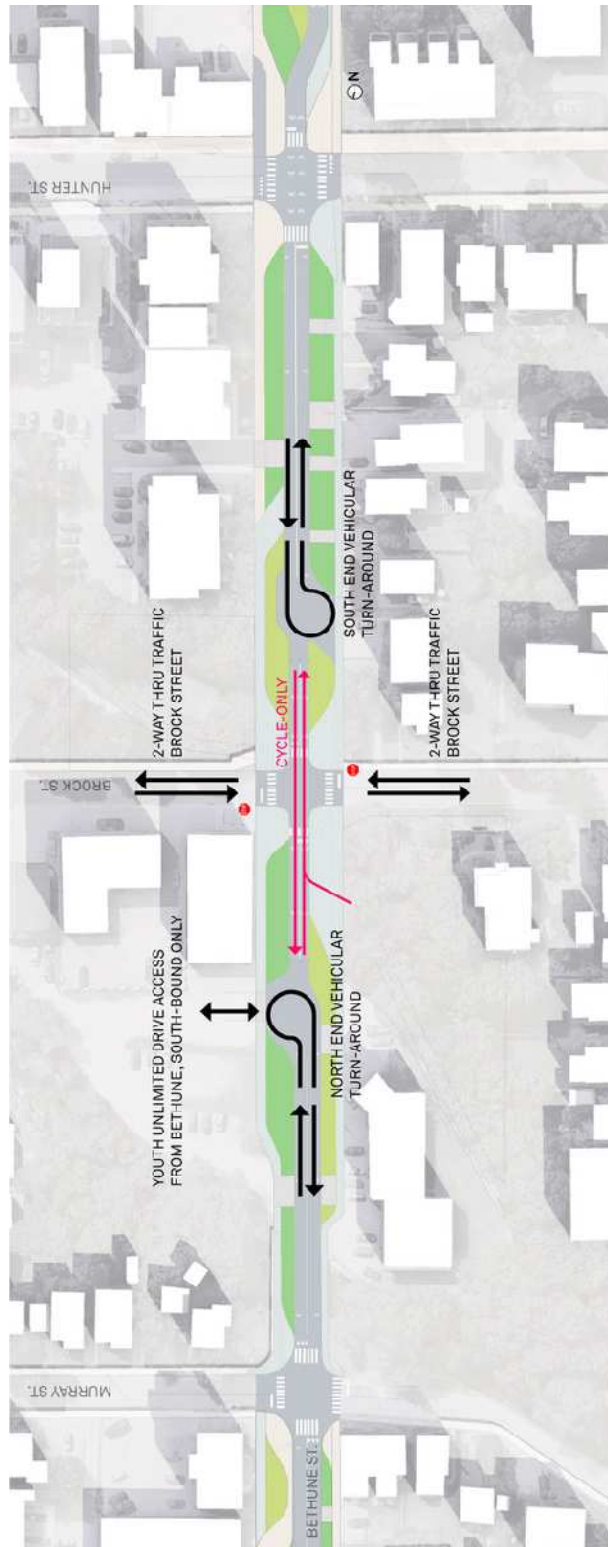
Bethunescape: Hunter Street to Murray Street Movement Flow
